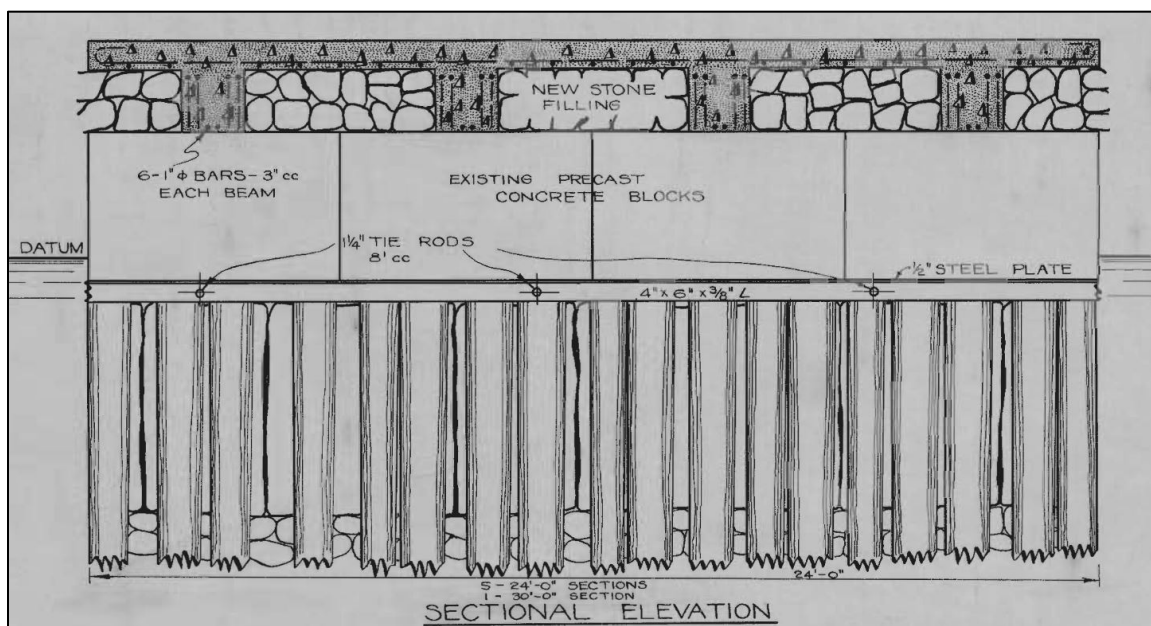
Detail elevation of the banquette being repaired with concrete, 1933. (Buffalo District files. Public domain.)
